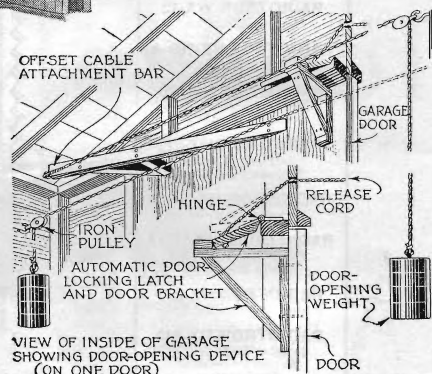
Arrangement of weights and pulleys to open garage doors and the release latch which is used to put the handy device in operation.
